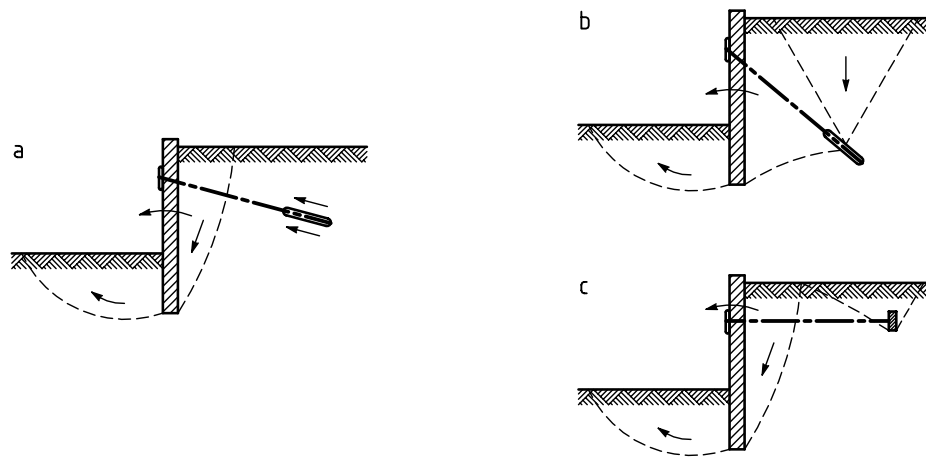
Examples of limit modes for failure by pullout of anchors.
